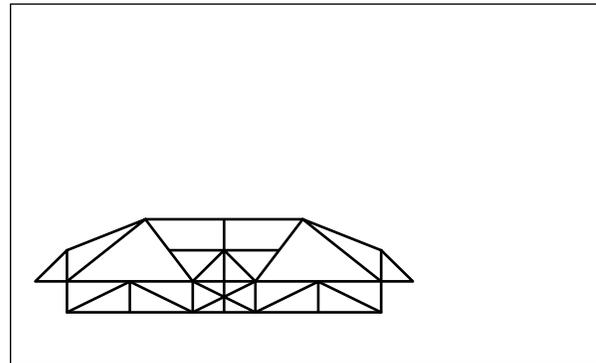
Side view of the bridge drawn in bottom-left corner of grid sheet
